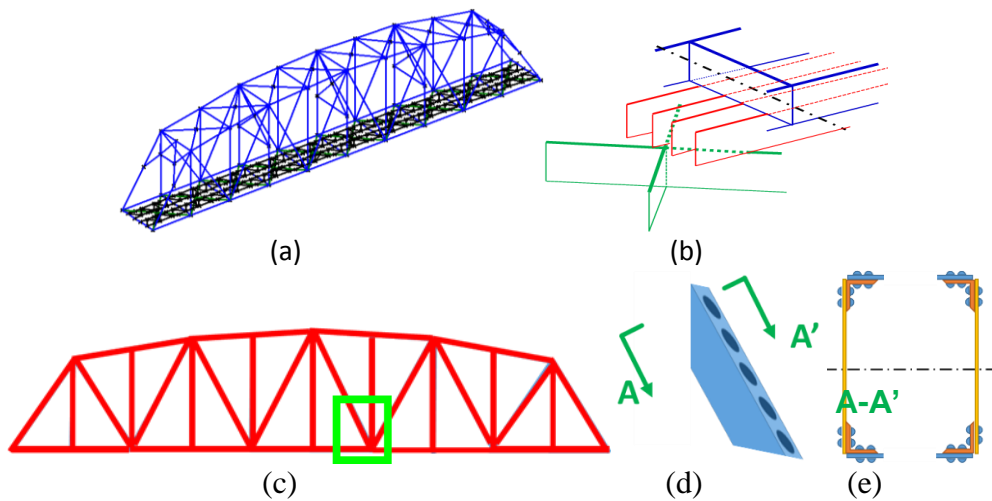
FE model: (a) 3D view, (b) floor system, (c) elevation, (d) element, and (e) gross area.
